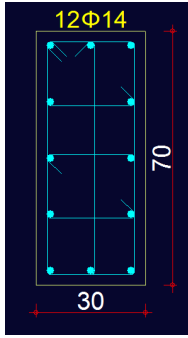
Column Reinf. Plan of 4 St. Build.
